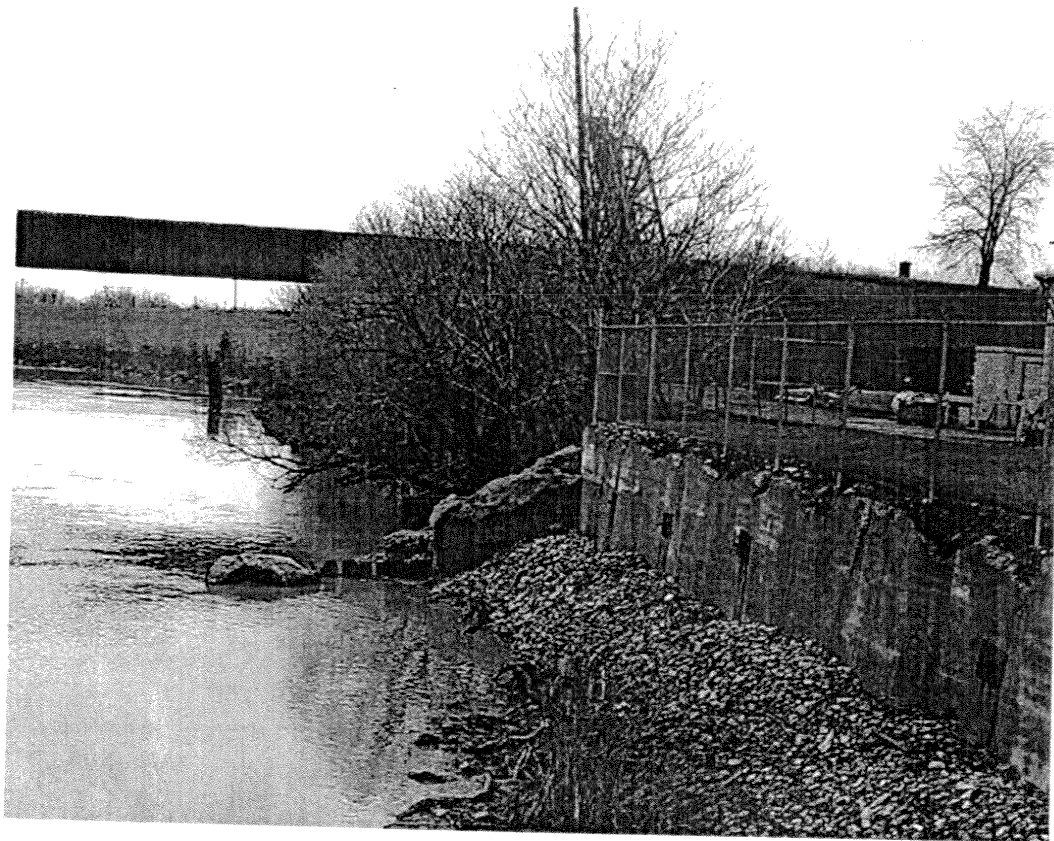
The proposed stabilization area is beyond the concrete abutment where the severely leaning tree indicates potential bank failure.
